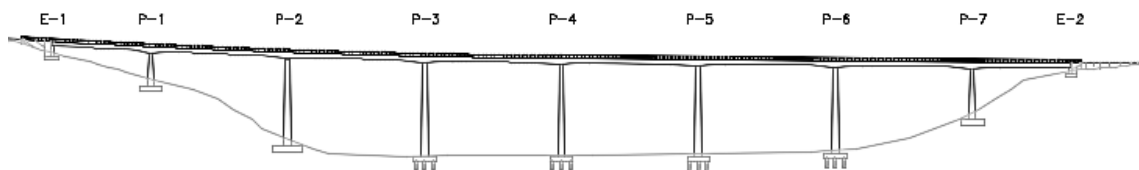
Río Cabriel* Bridge - Elevation view.
